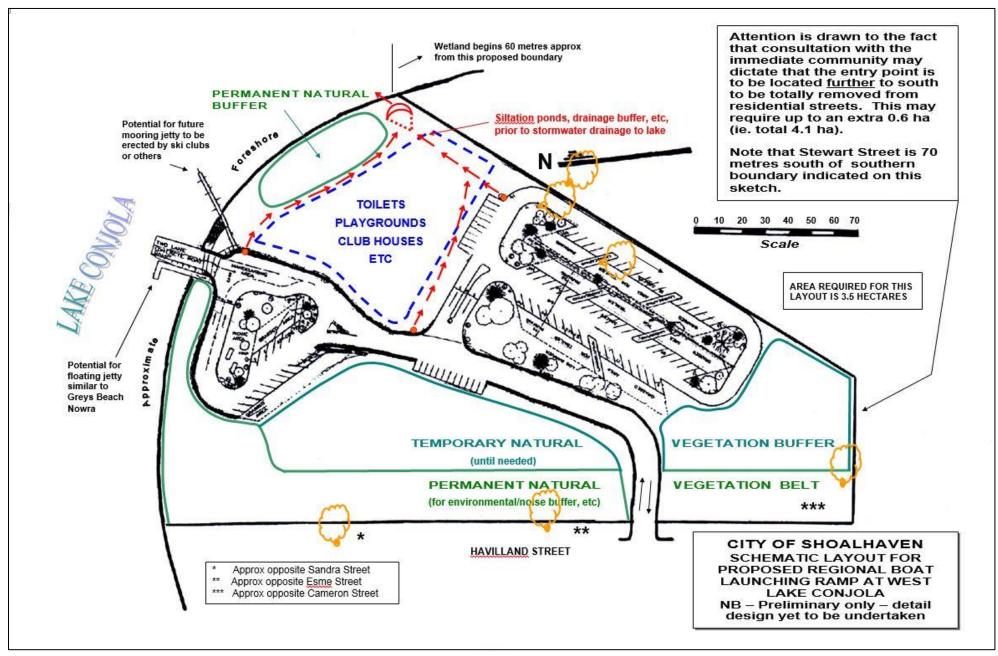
Concept plans for proposed boat ramp and facilities. Source: MIEngineers
